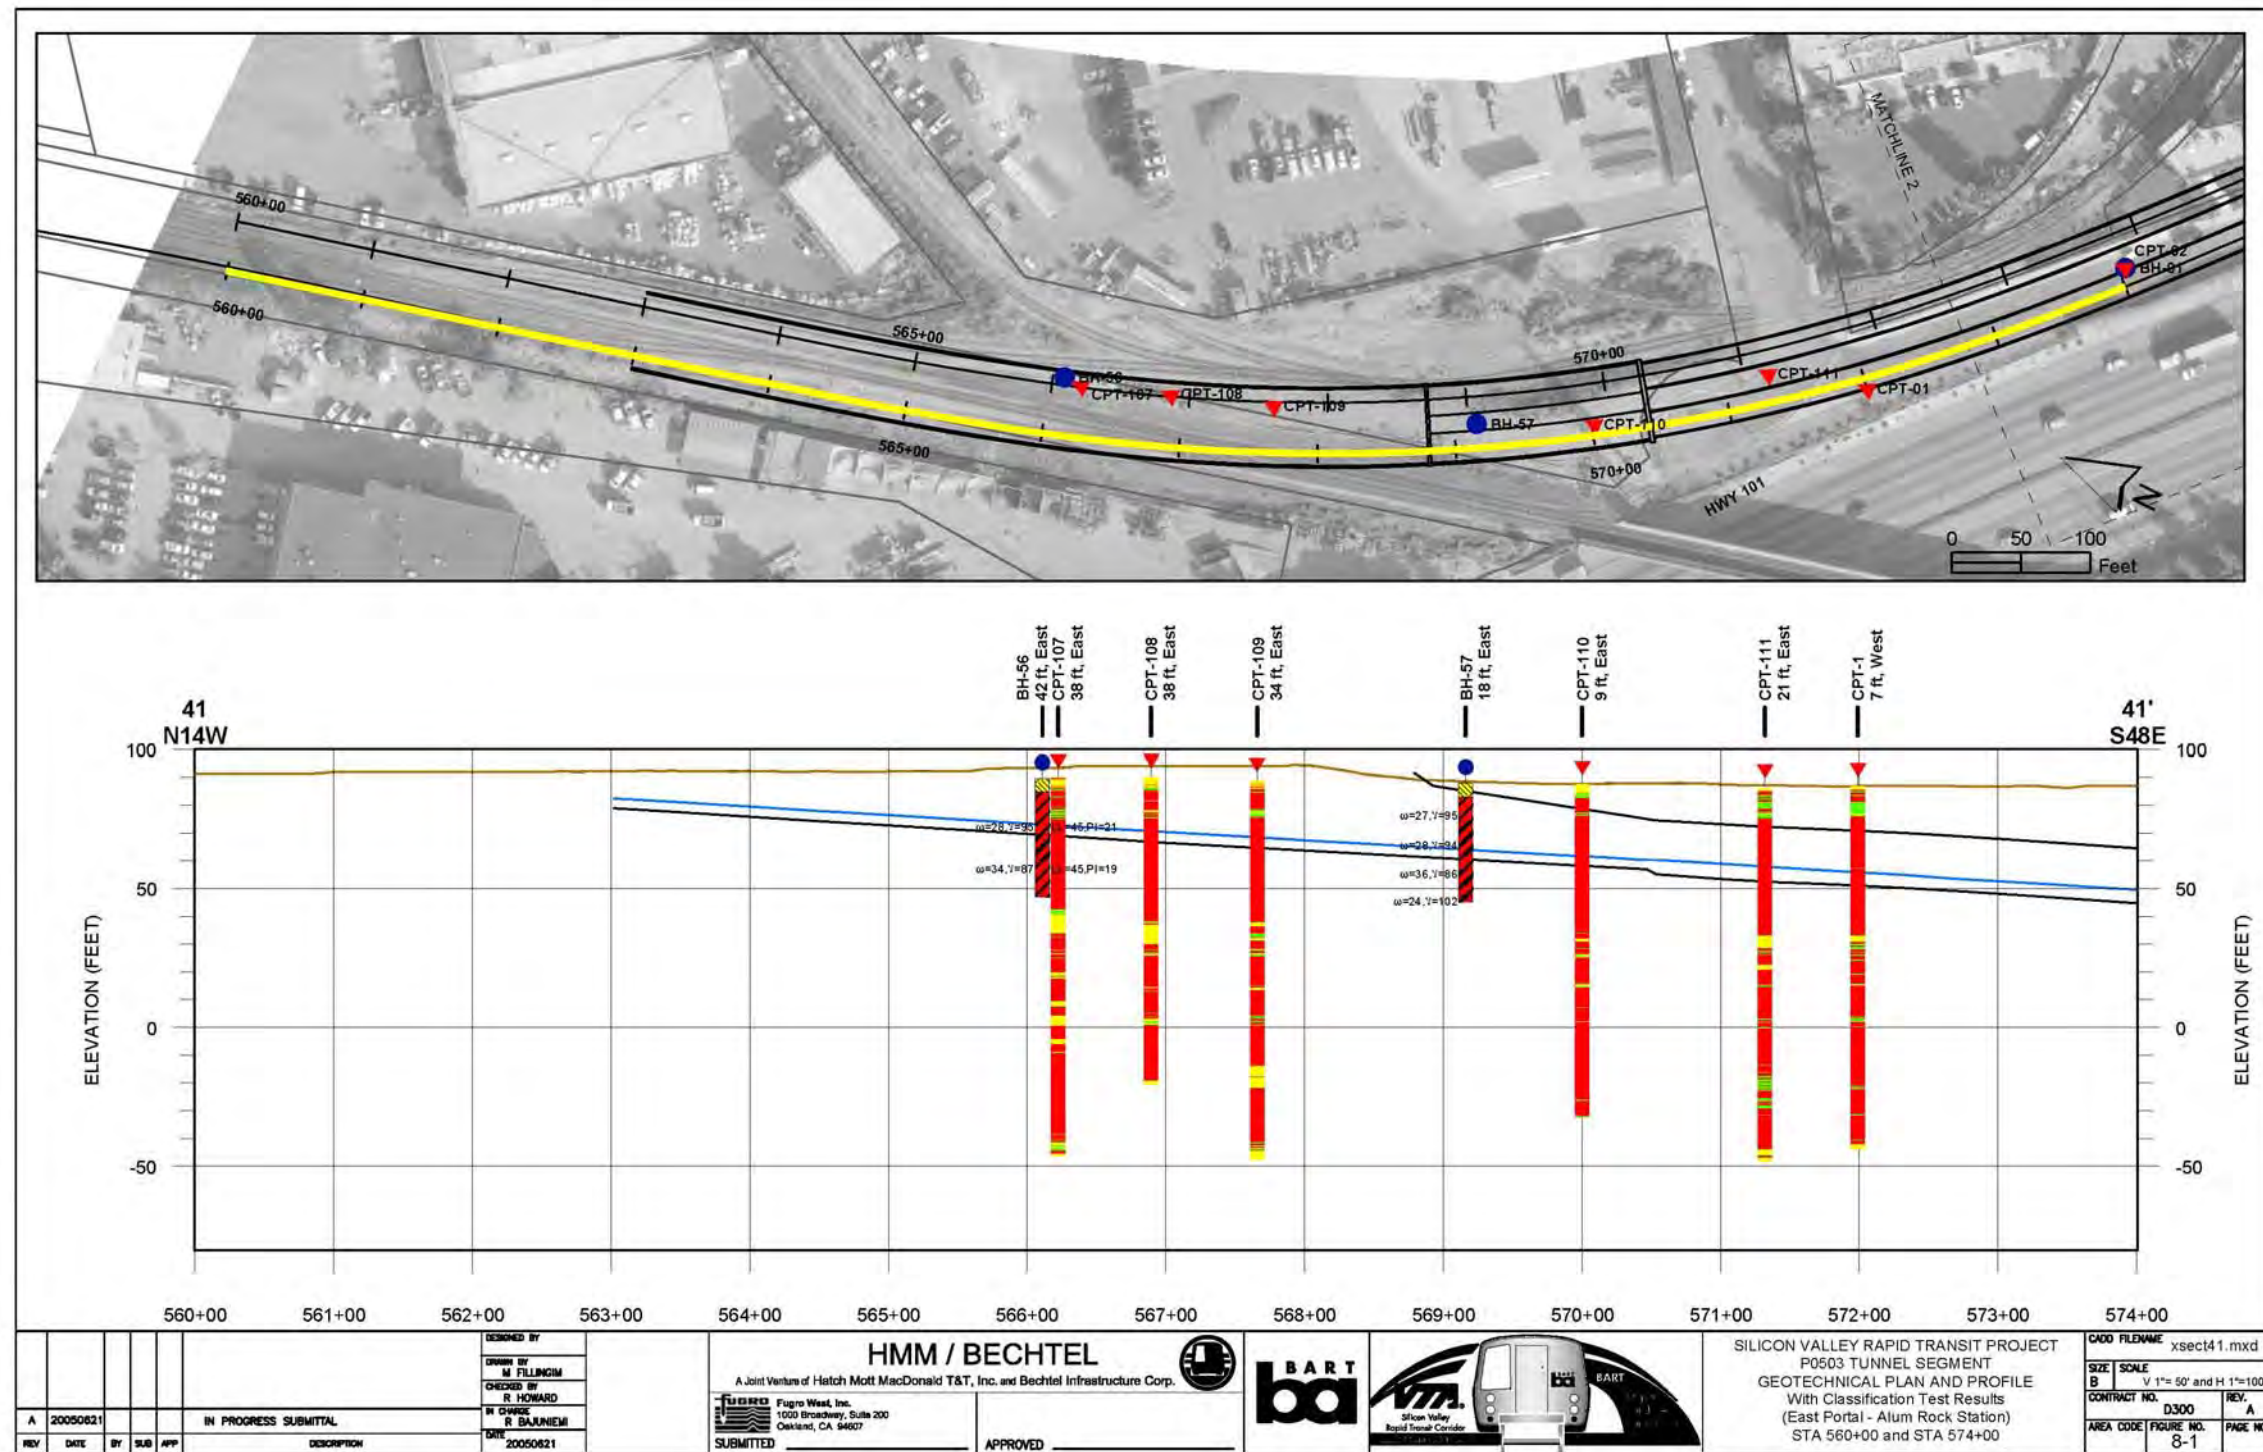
Geotechnical Plan and Profile with Classification Test Results: Station 560+00 to 574+00.
